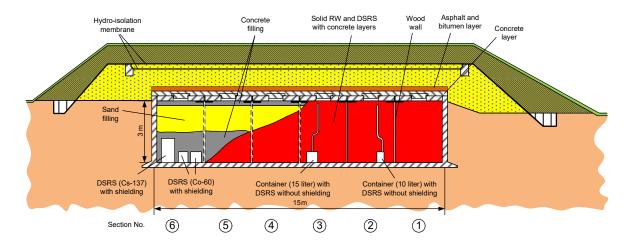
MRWSF with upgraded protective engineering barriers in 2006.
